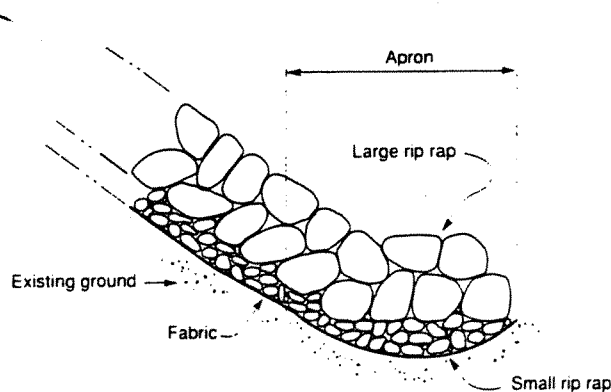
Typical erosion control system for lake shore, stream bank, culvert outfall or ditch protection.
